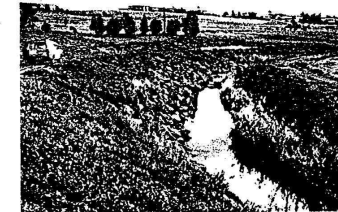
View looking downstream from the Railway Trestle Bridge towards Athens Court. Note the fill in the left foreground
